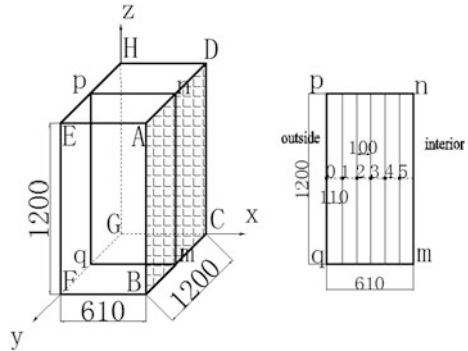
The structure of the rib-steel-finned heavy wall
